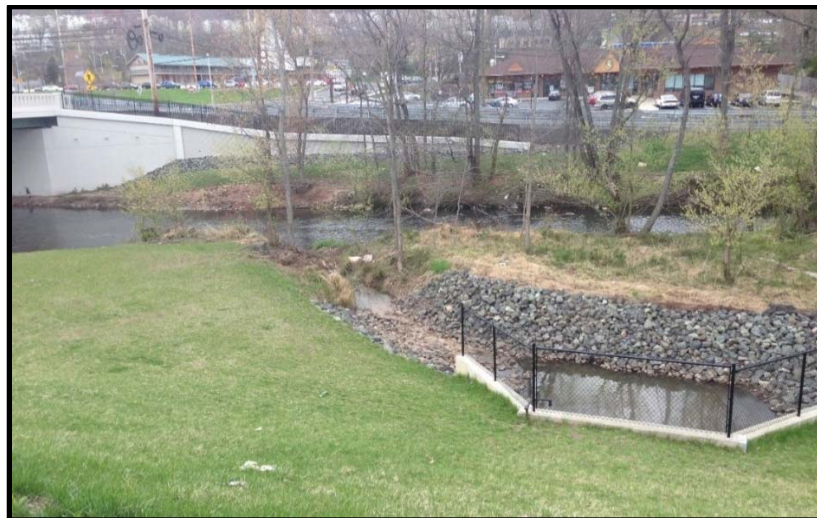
Concrete Retaining Walls and Sloped Grassed Embankments.
